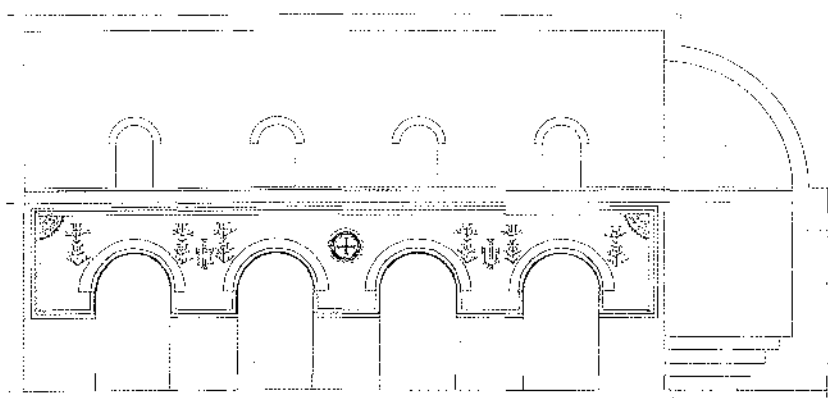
North wall, first layer. Reconstruction of painting decoration
